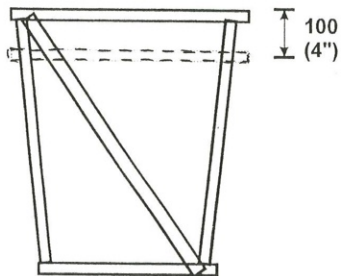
Template 'A' modified for base concrete level (NOTE AND ADJUST FOR SLOPE OF MOTORPIT FLOOR (MODELS SA 201 / SA 301 / SA 372))
